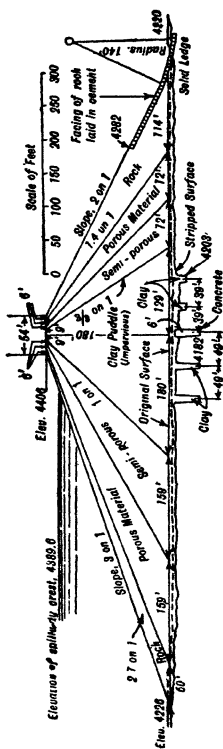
Davis Bridge Dam, Vermont, Showing Progress Cross-sections.\* Built by Semi-hydraulic Fill Method.
